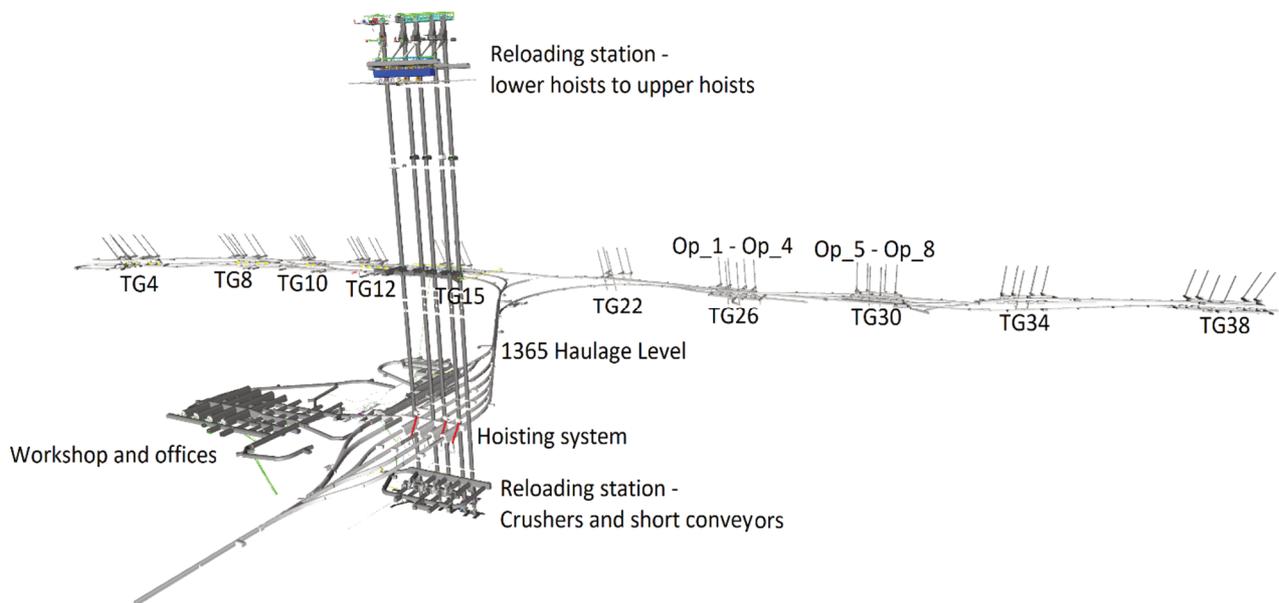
1365 – main haulage level in Kiirunavaara Mine
